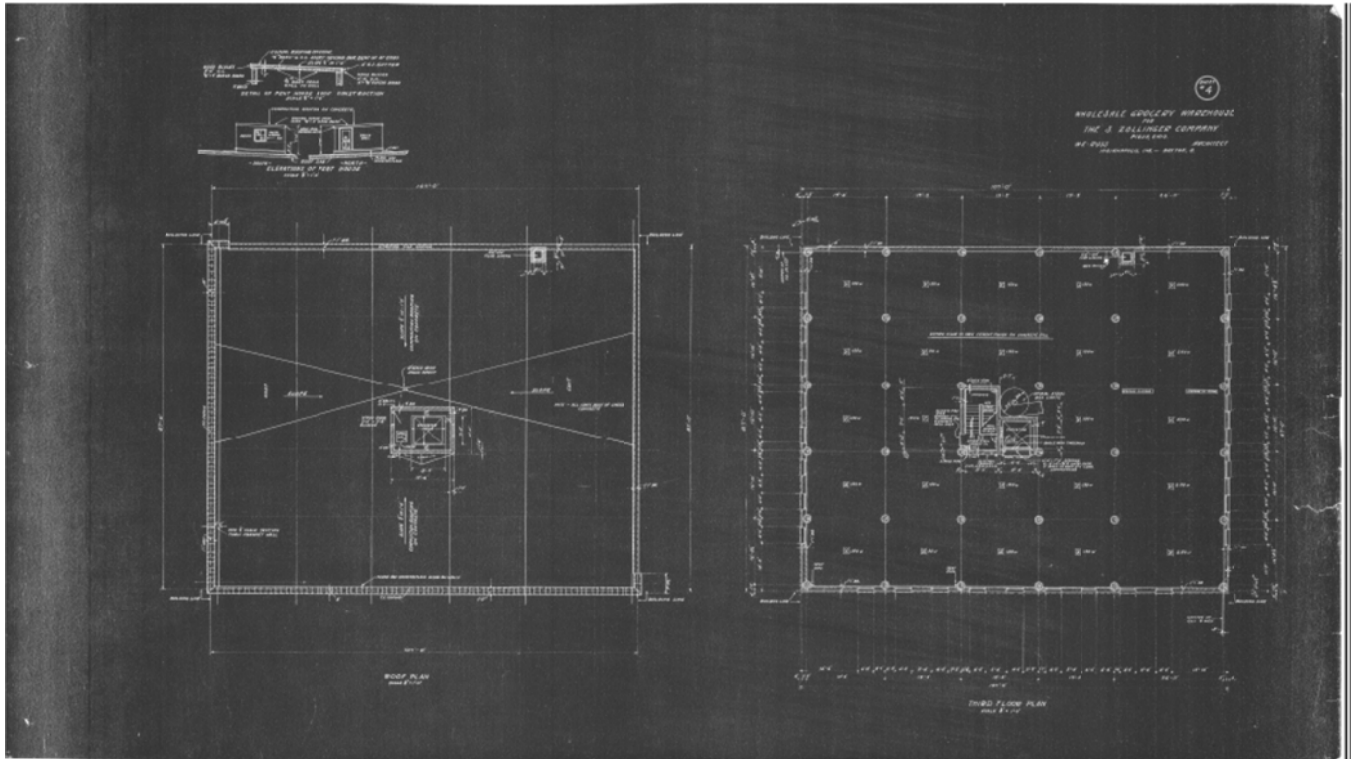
Third Floor and Terrace Plans of the Zollinger Building, prepared by William Earl Russ, Architect, in 1914.
